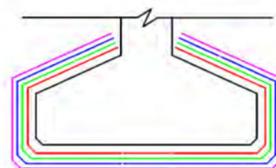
FRP repair approach for cracked precast girders [36]
